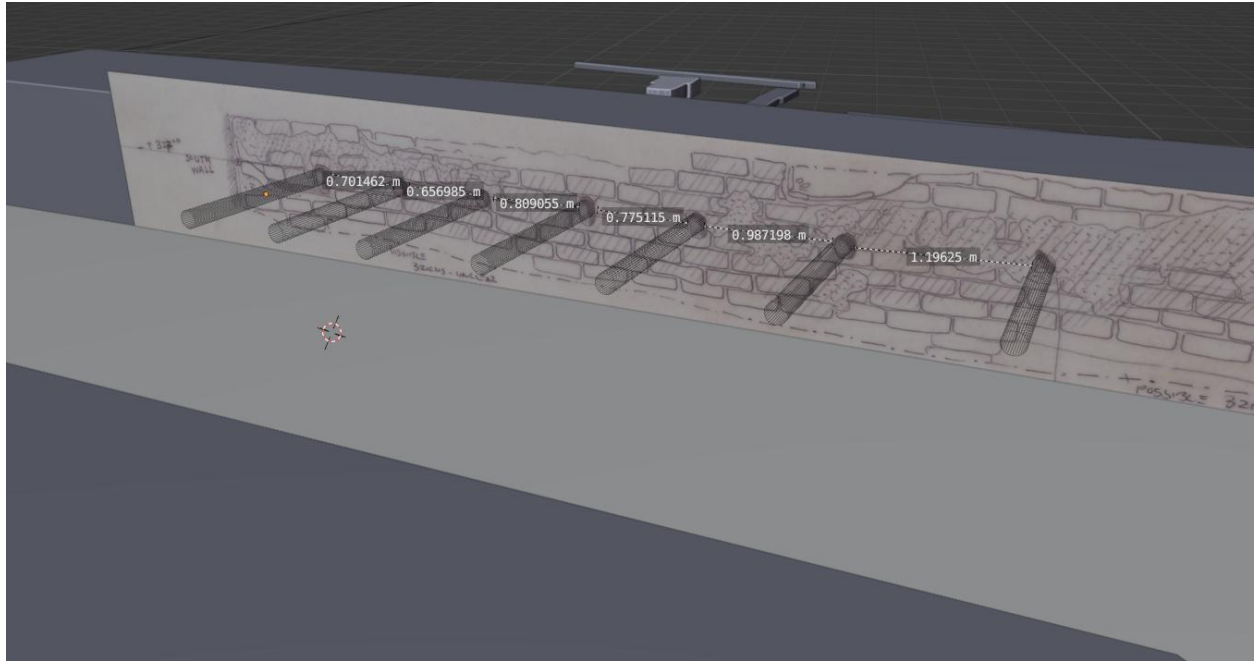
Drawing of the holes in 3D view with simple poles stuck into the holes.
